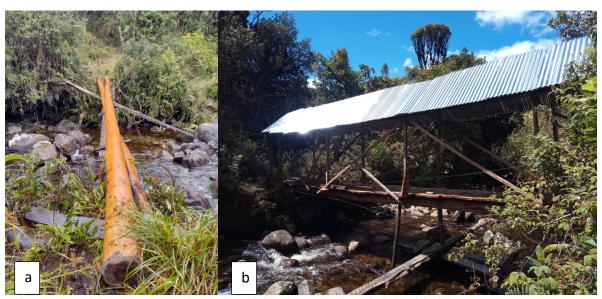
Bridge construction. a) Bridge beams. b) Finished bridge
